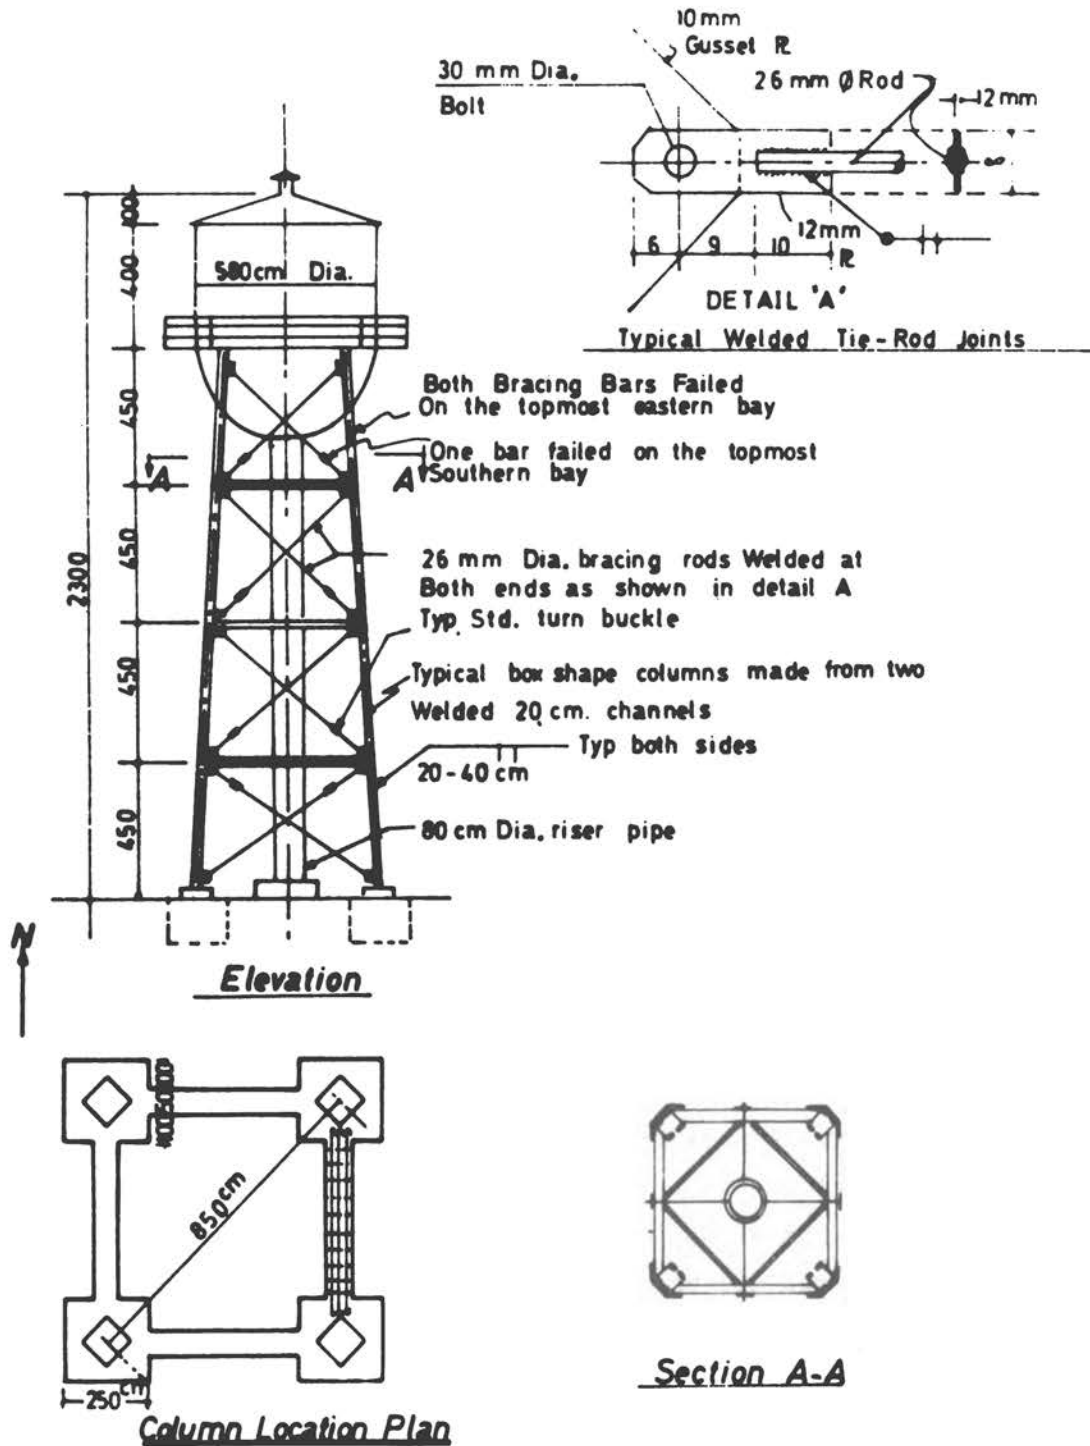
Summary Details of the Elevated Steel Water Tank of Qir.
